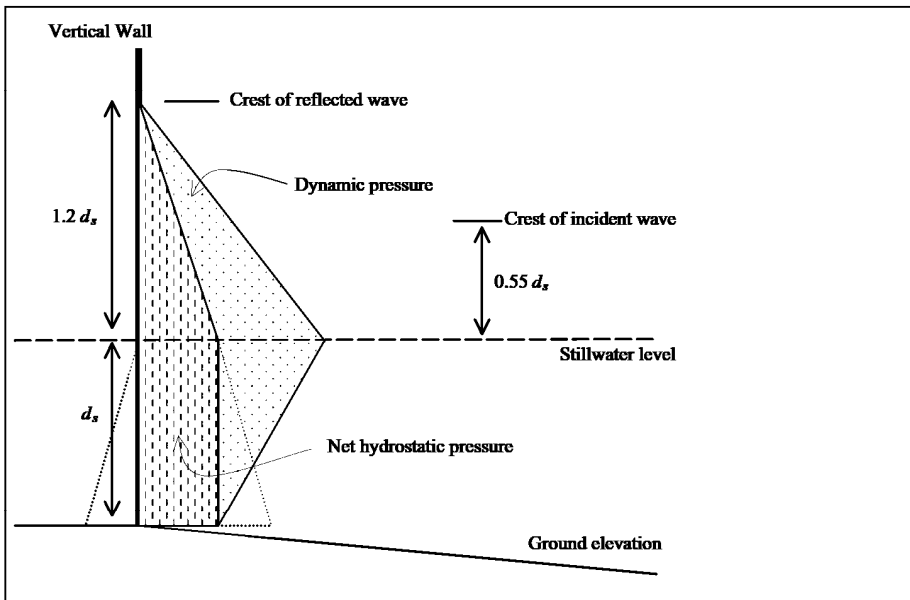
Normally Incident Breaking Wave Pressures against a Vertical Wall (Still Water Level Equal on Both Sides of Wall).
